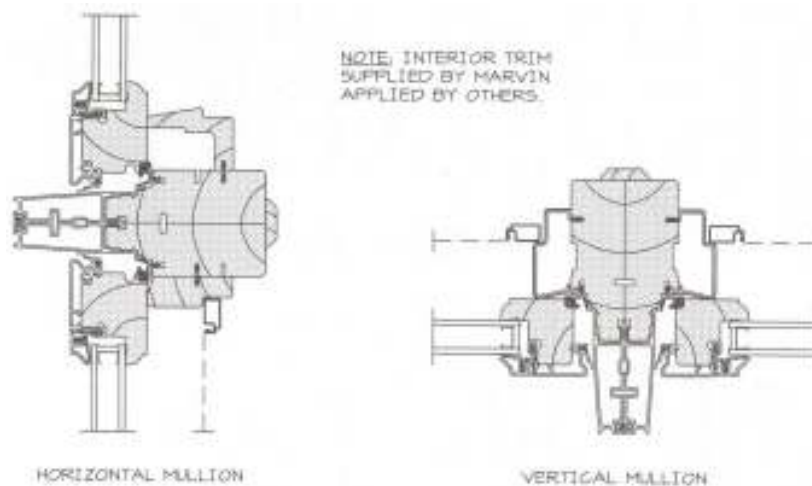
Mullion details of an aluminum-clad wood-frame window.
